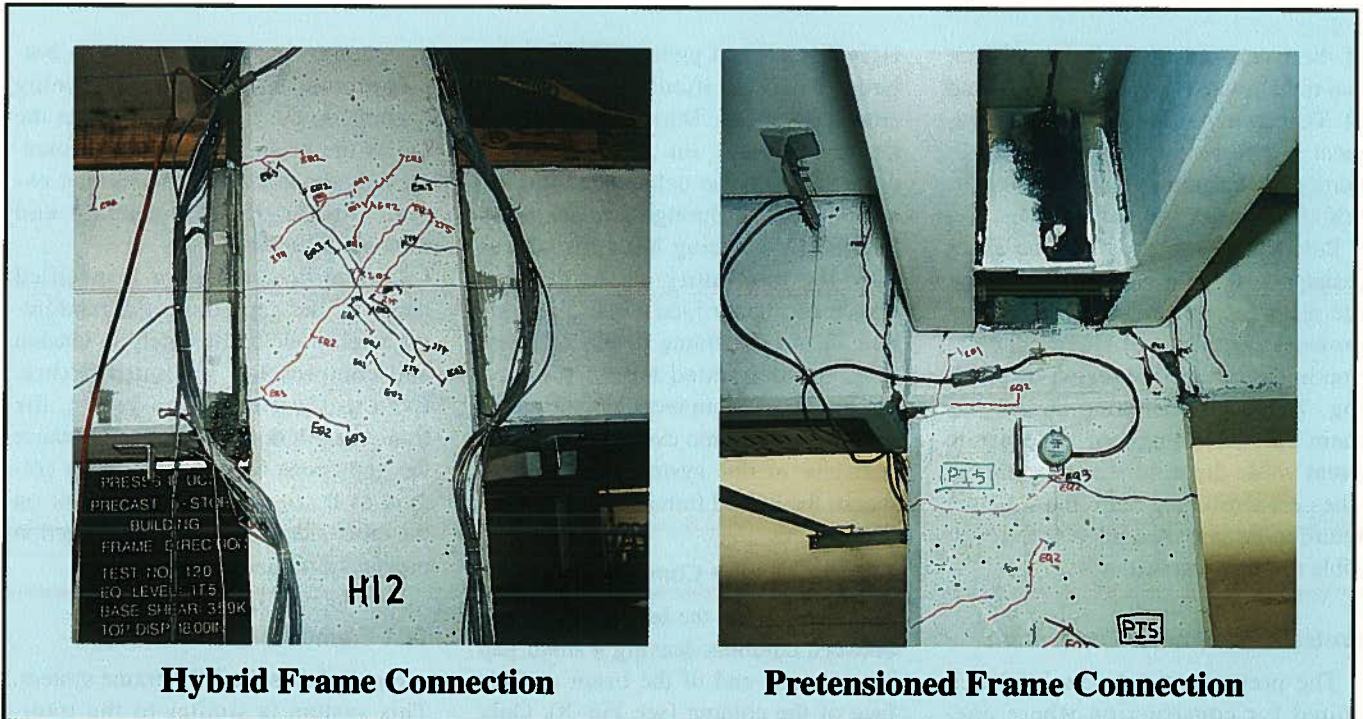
Condition of the hybrid frame connection (left) and pretensioned frame connection (right) after structure was subjected to drift levels more than twice the design level.⁴
